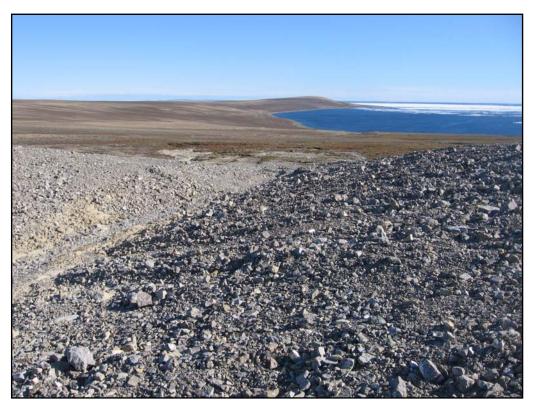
Northing: 8368751 Easting: 559743 Elevation: 46 m. Drainage crossing through road with downstream erosion
